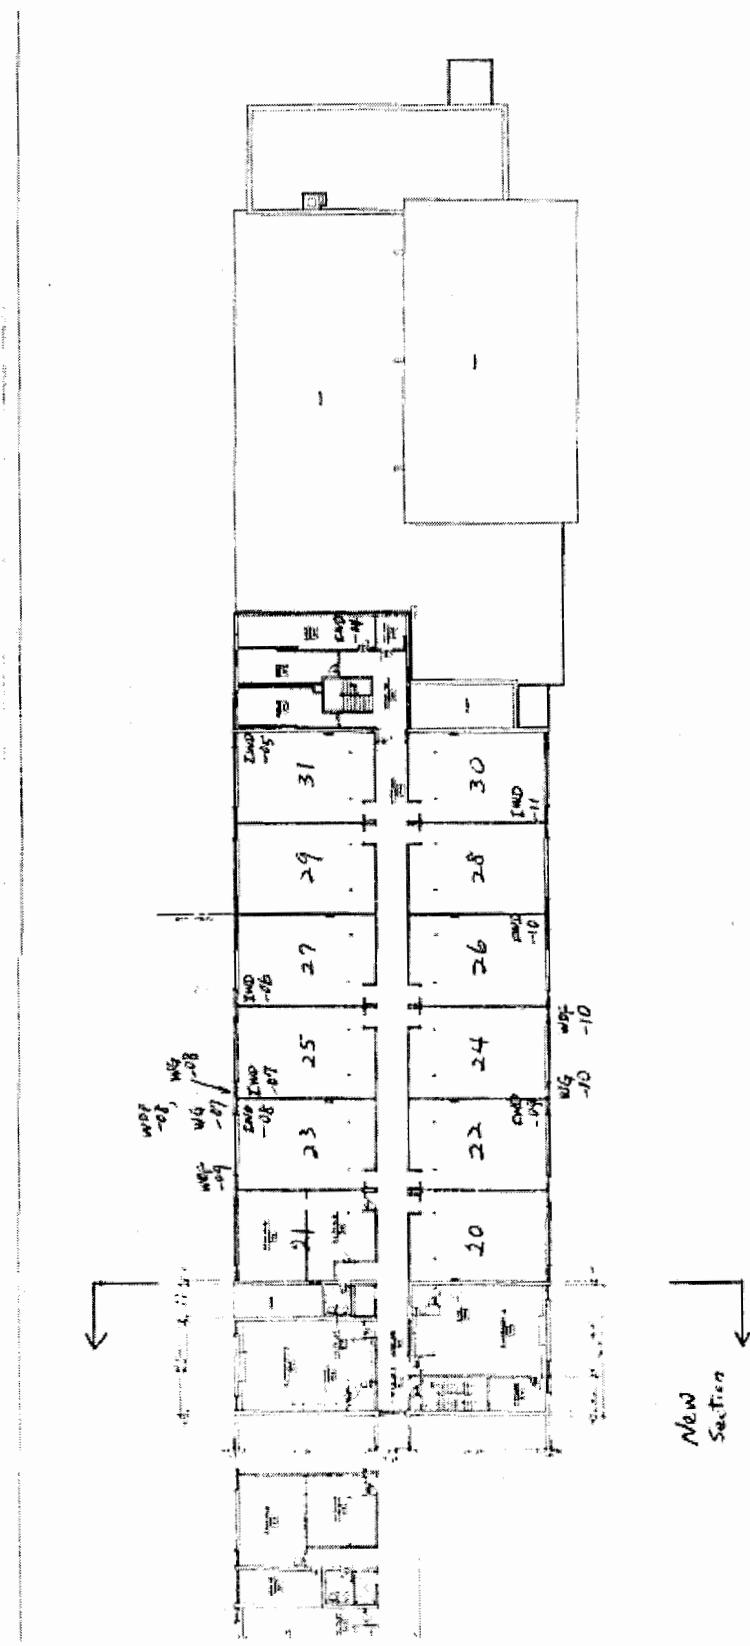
(continued). Farmland ES Floor Plan Showing Caulk Sampling Locations (Second Floor)
